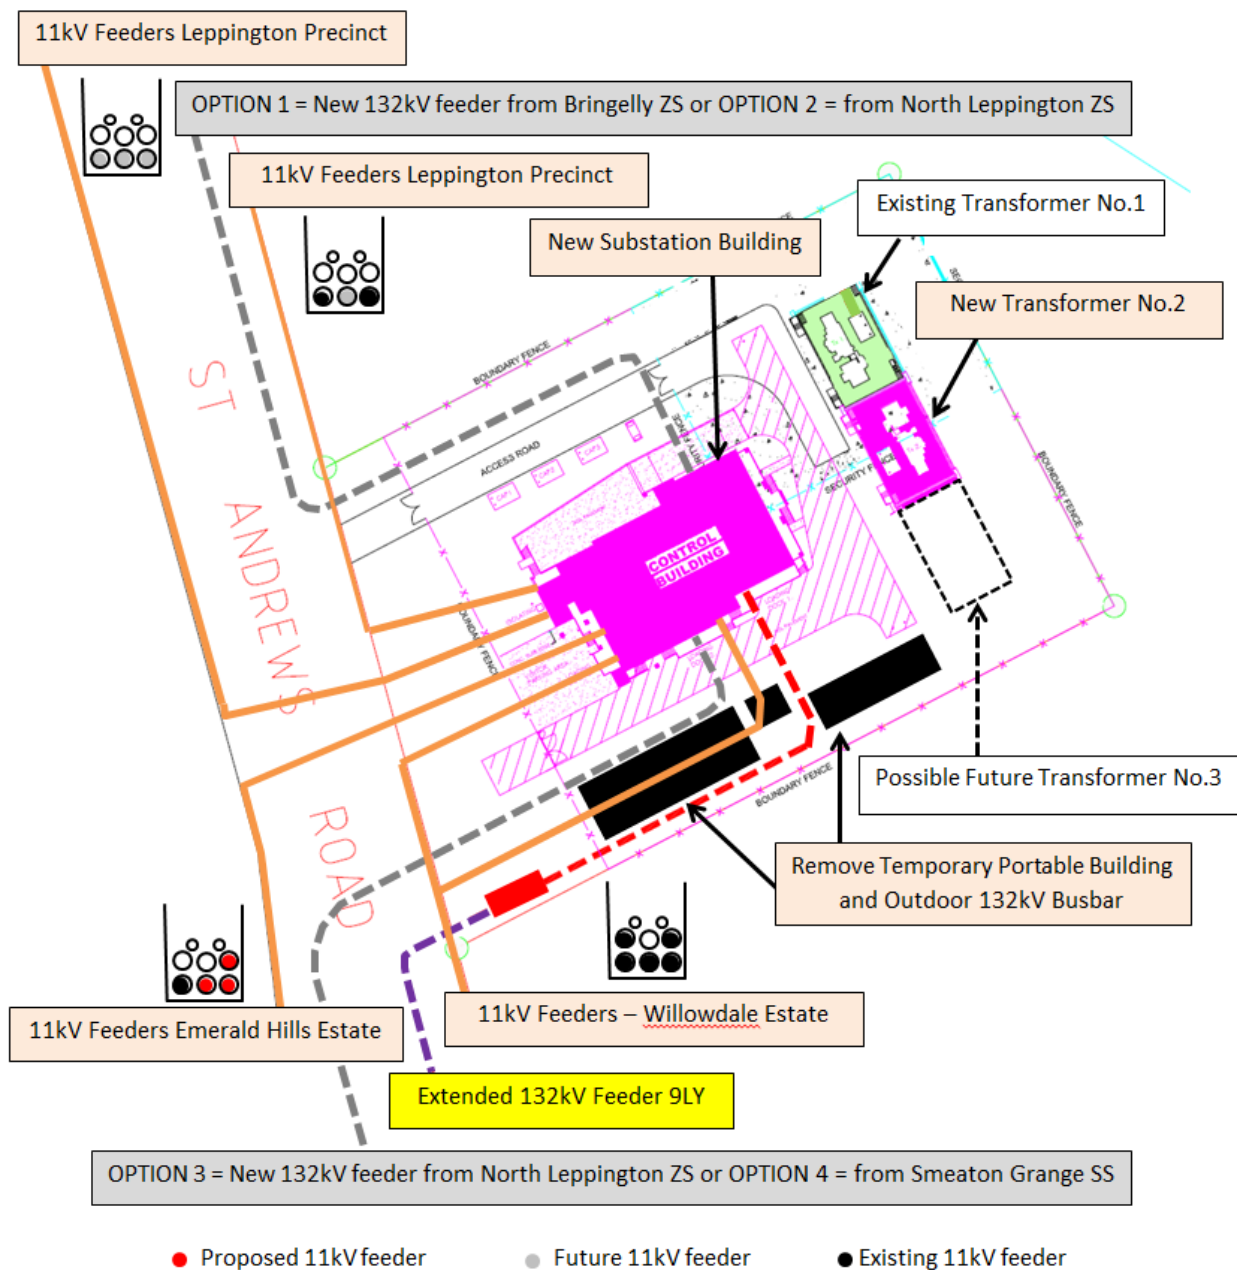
Preliminary Substation Layout of South Leppington Zone Substation
